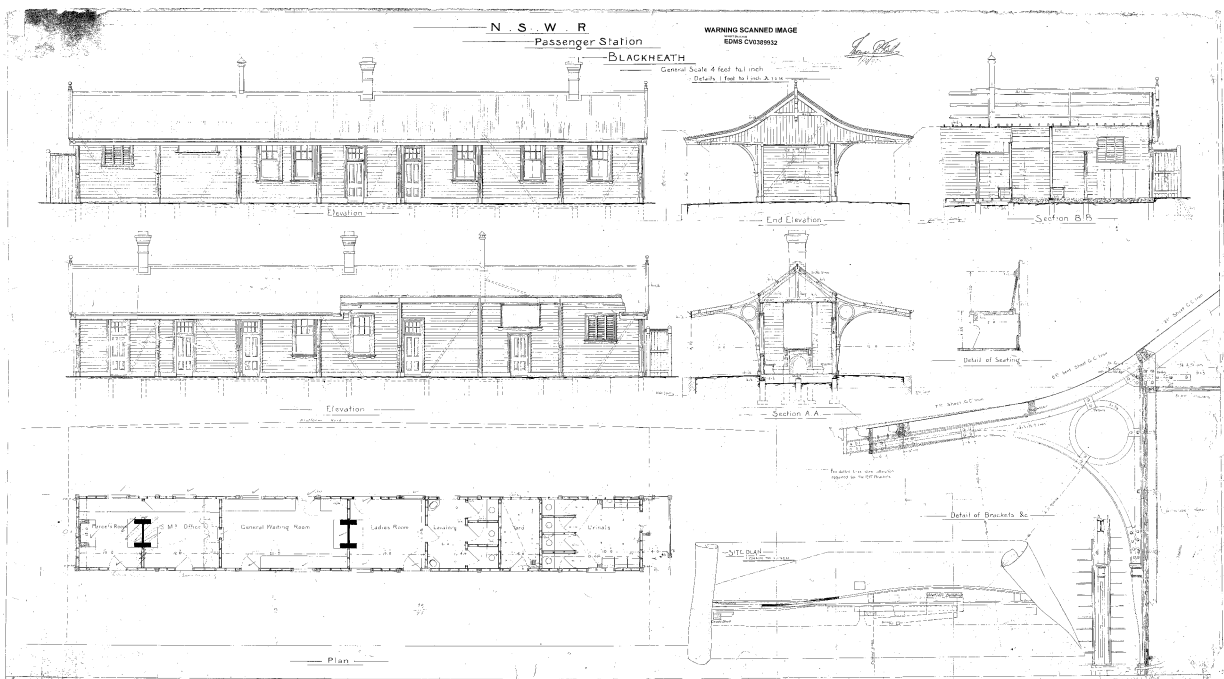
1898 plan of the new station building Source: Sydney Trains Plan Room, CV0389932
